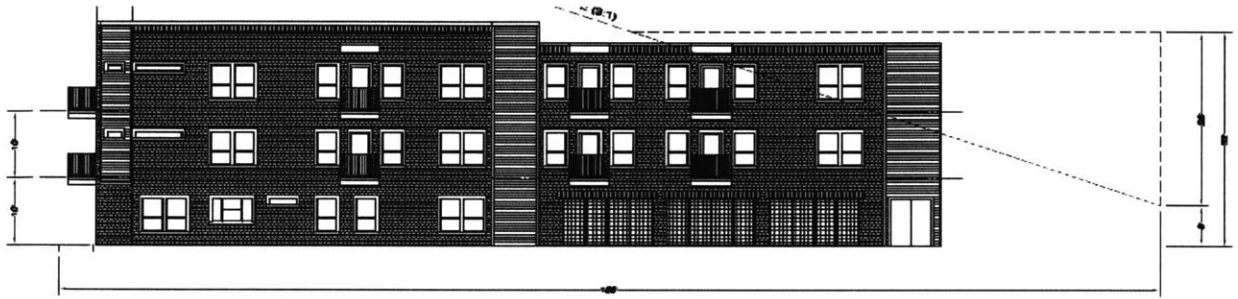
Elevation Looking South from Canty Street (Graphic Provided by Owner)
